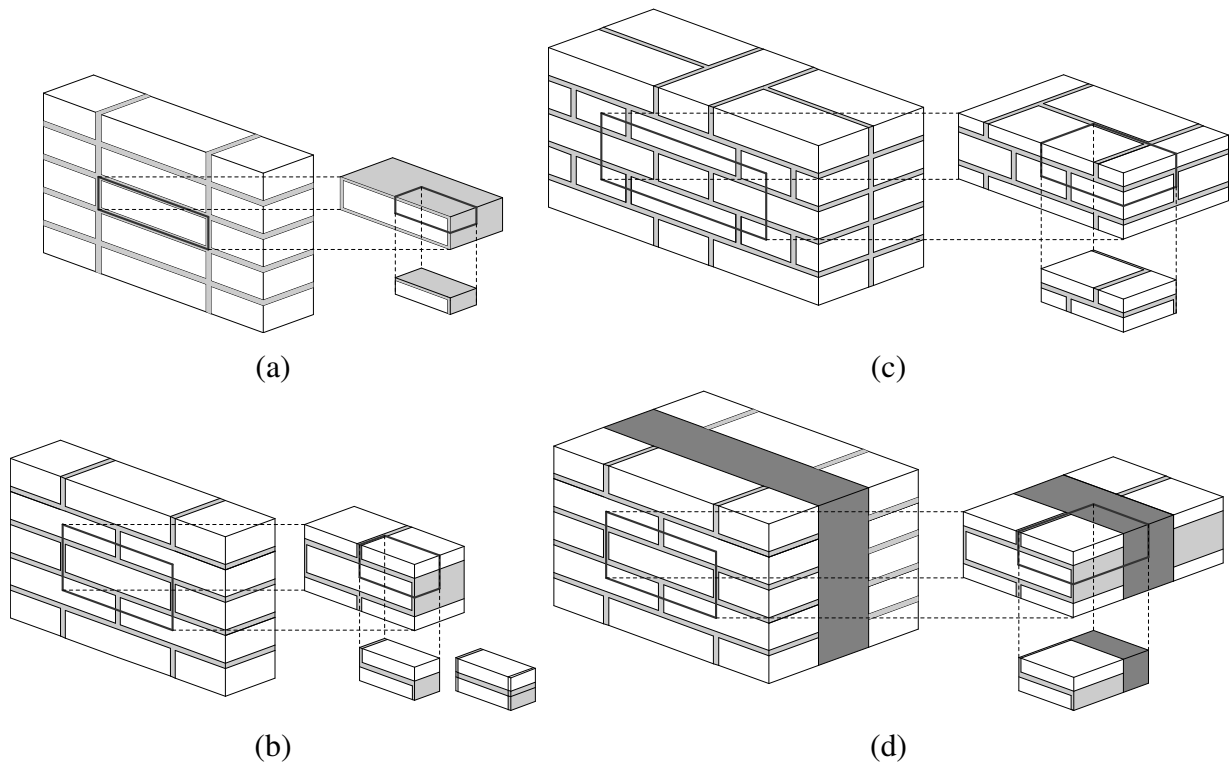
Derivation of wall cells: full wall, repeating pattern and cell derived from geometrical symmetry of repeating pattern. (a) Stack bond wall, (b) running bond wall, (c) Flemish bond wall and (d) three-leaf wall with running bond outer leaf.
